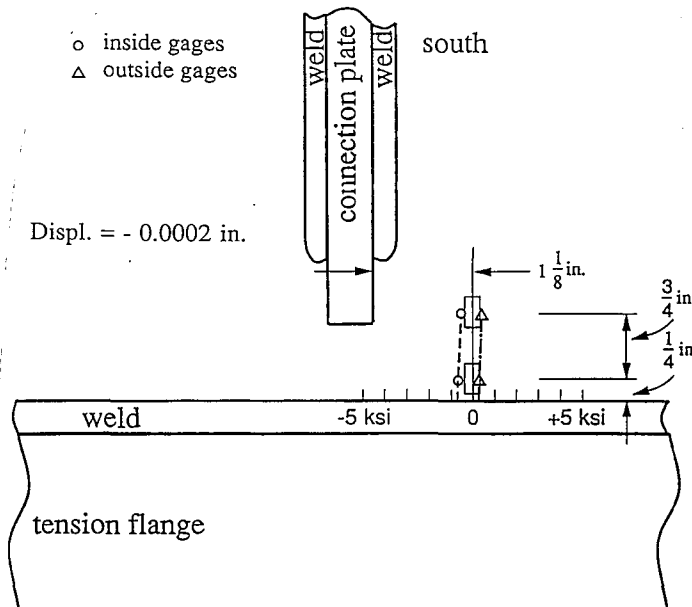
Static Stress Distribution for Inside Girder at Pier S7-12 Floorbeam Three with the Lowboy in the Outside Lane
